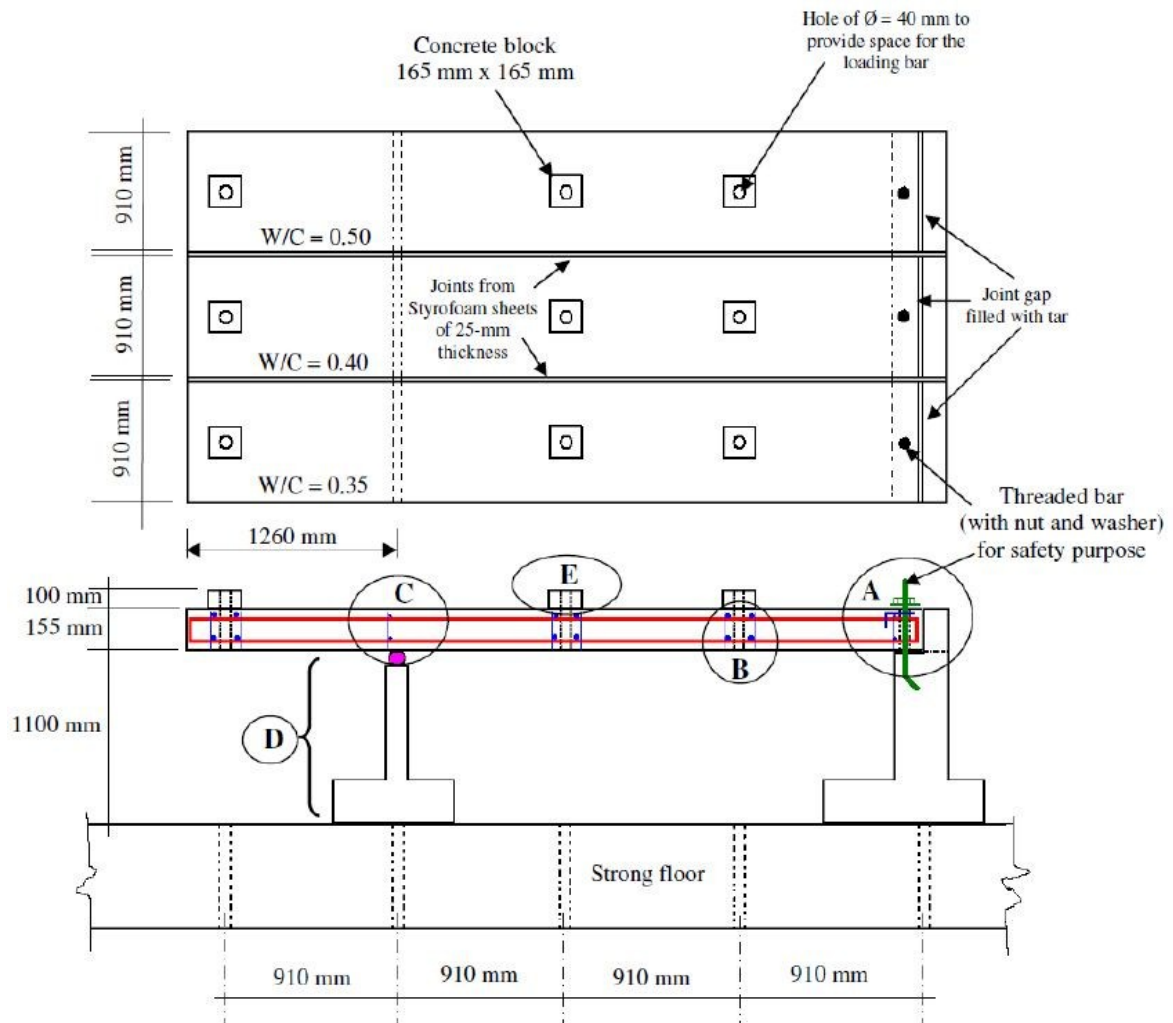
Plan and side view of slabs (reproduced from Deif 2010).
